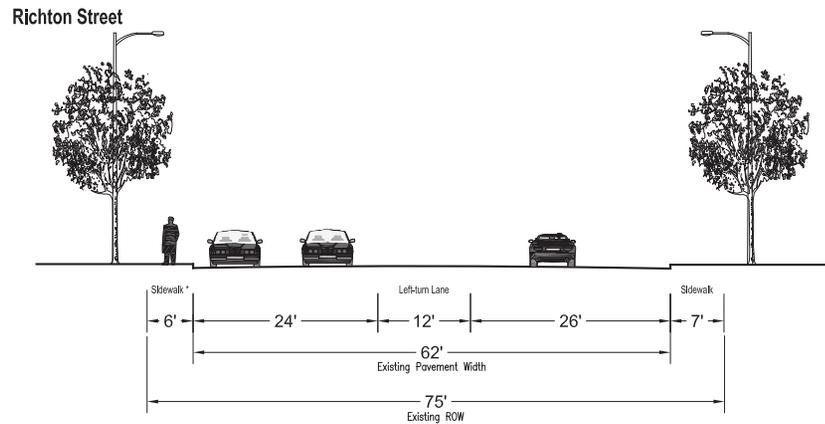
TYPICAL SECTION - RICHTON STREET
